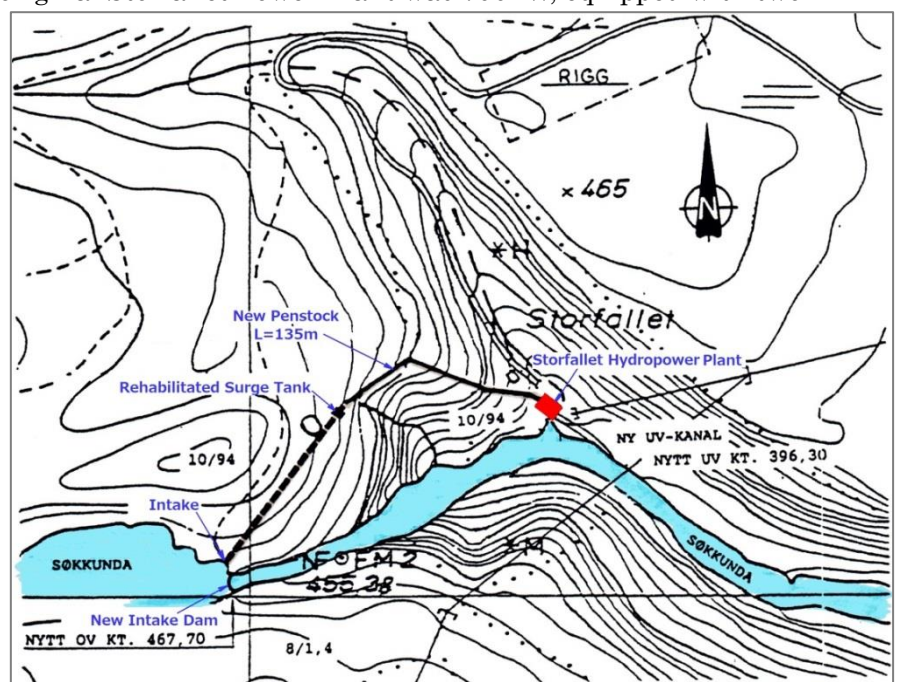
Outline of Storfallet Hydropower Plant^[5]
